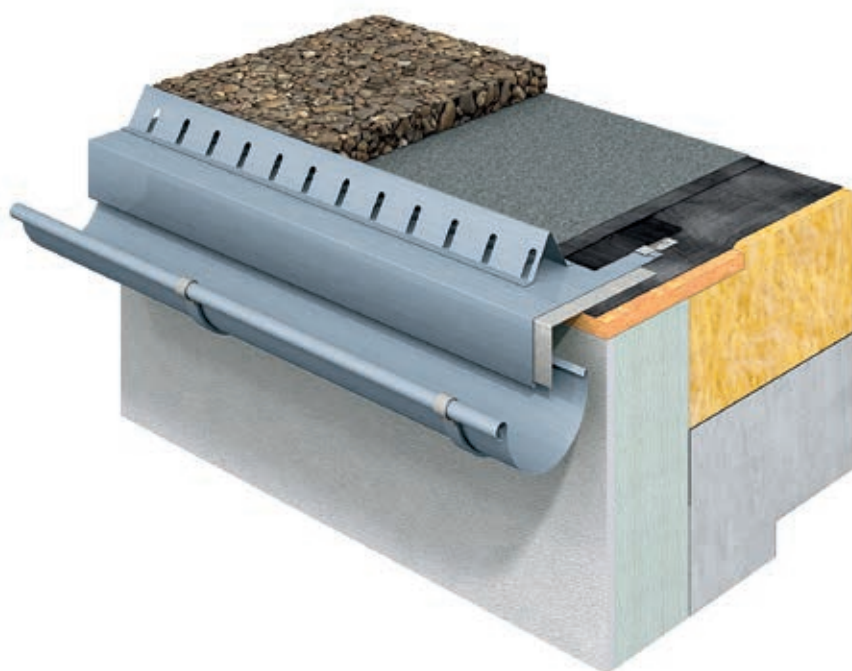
Roof edge with a sealing function and external drainage – Variant with gravel strip
